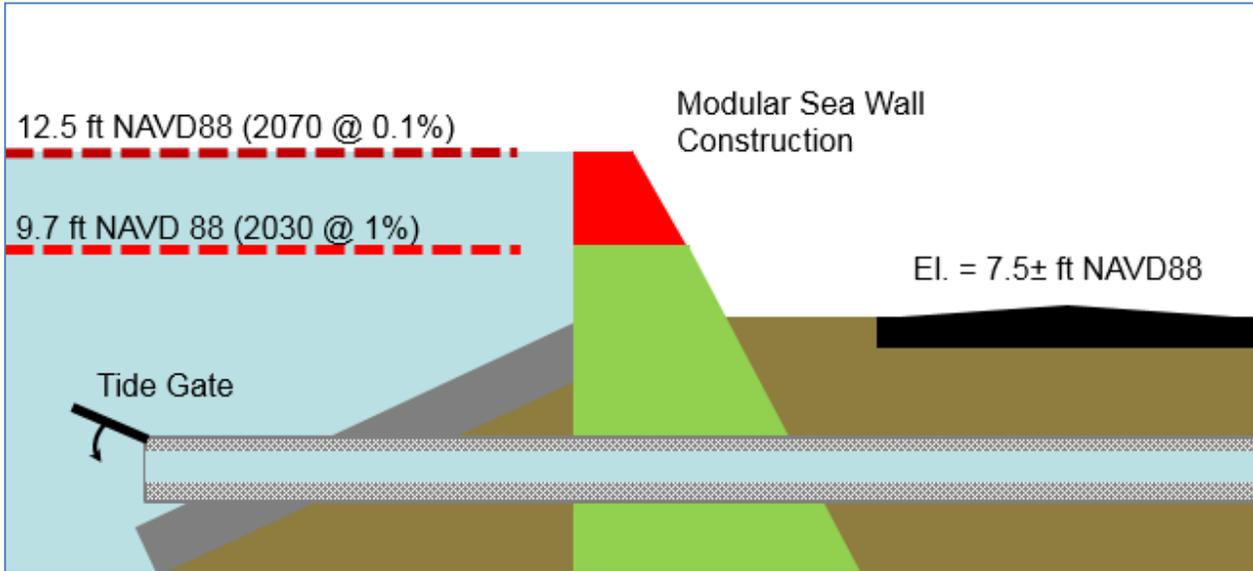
Seaview Avenue at Farm Pond – Future Phase 2 Sea Wall Construction
